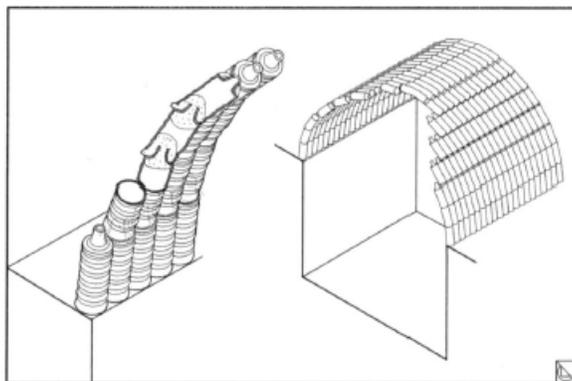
Reconstruction of barrel vault constructed with vaulting tubes.
